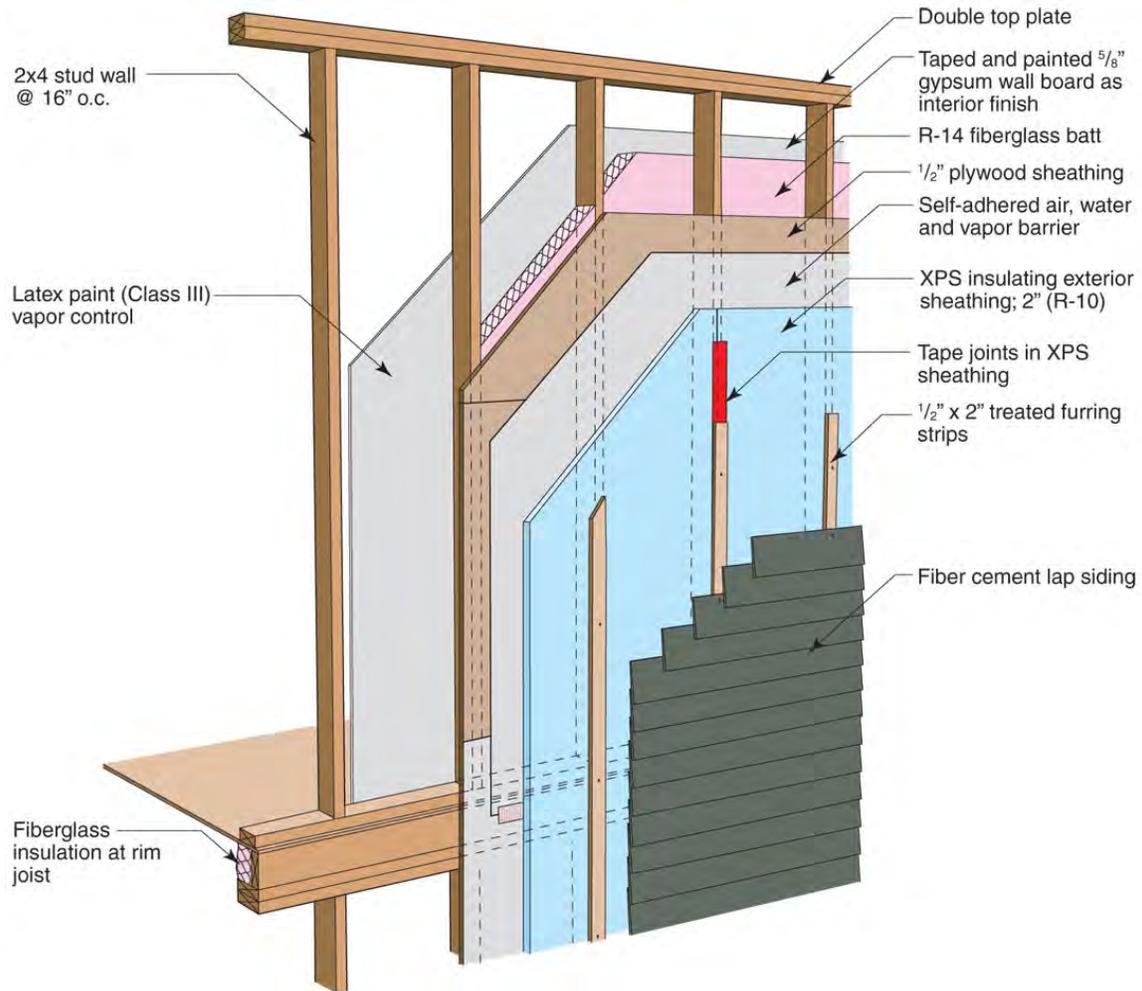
2x4 wall construction with XPS insulation and fiberglass batt
